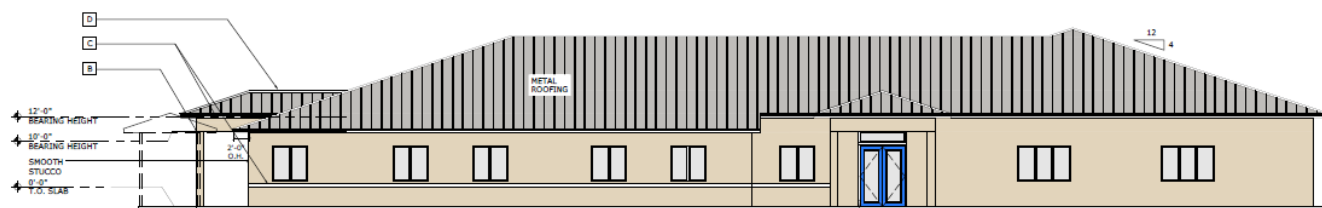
North Elevation – Family Shelter Phases 1 and 3
